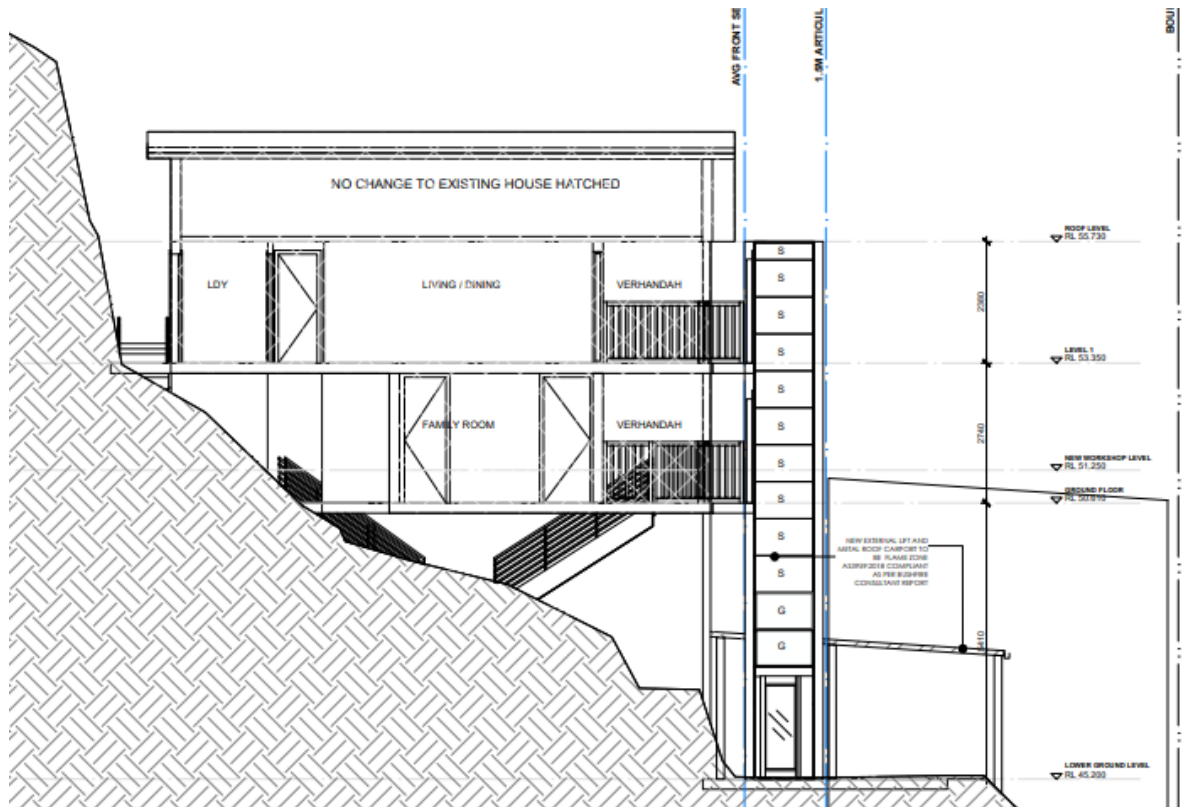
Cross-Section through dwelling showing height of existing dwelling (12.69m) and height of proposed lift (10.53m)
